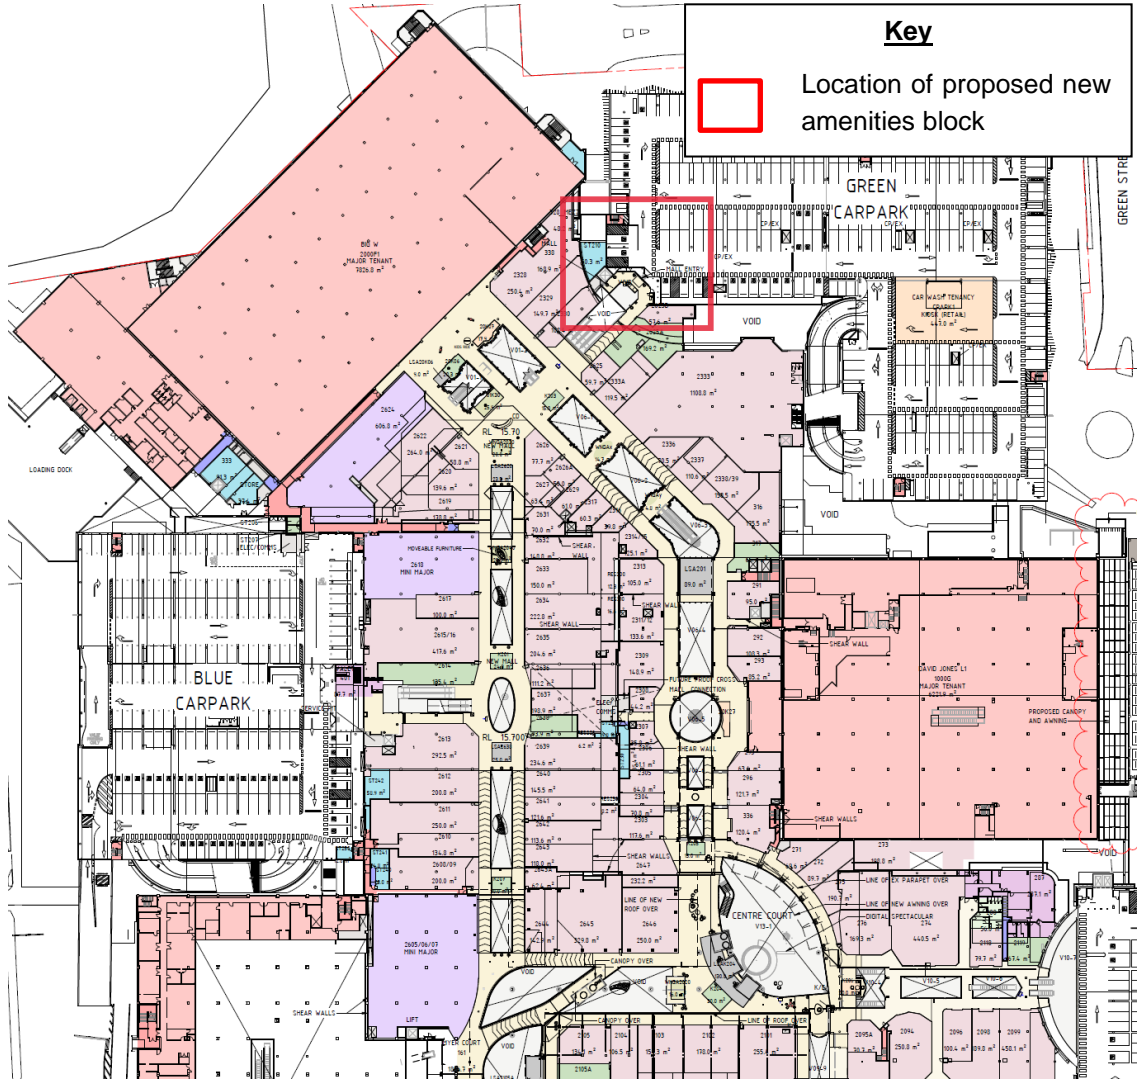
Location of the proposed amenities block (highlighted in ‘Red’ box) – Level 1, Warringah Mall
